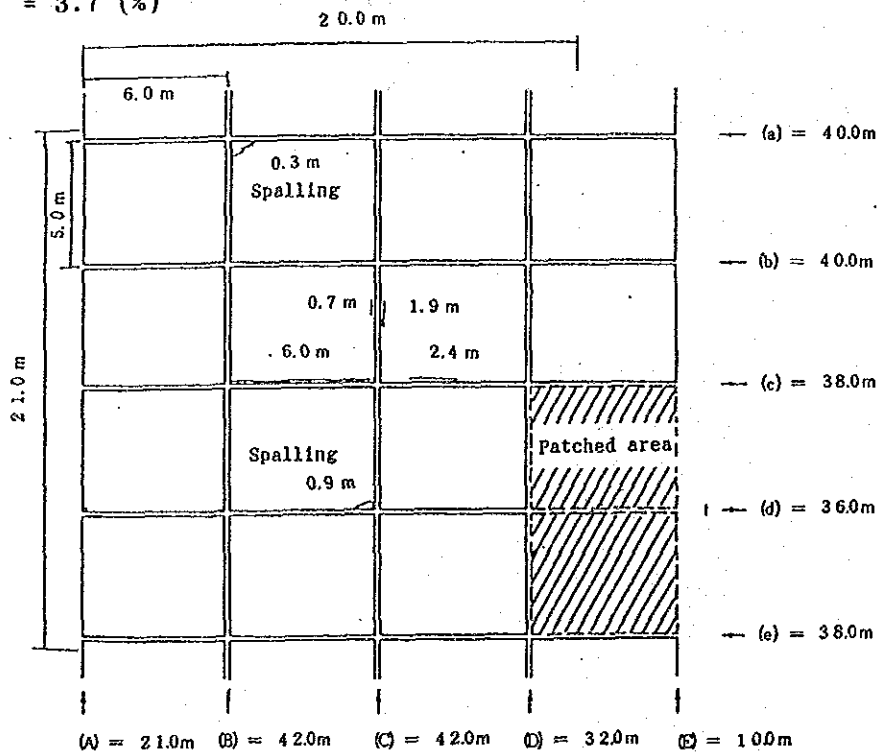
Example of Spall inspection for Rigid Pavement
